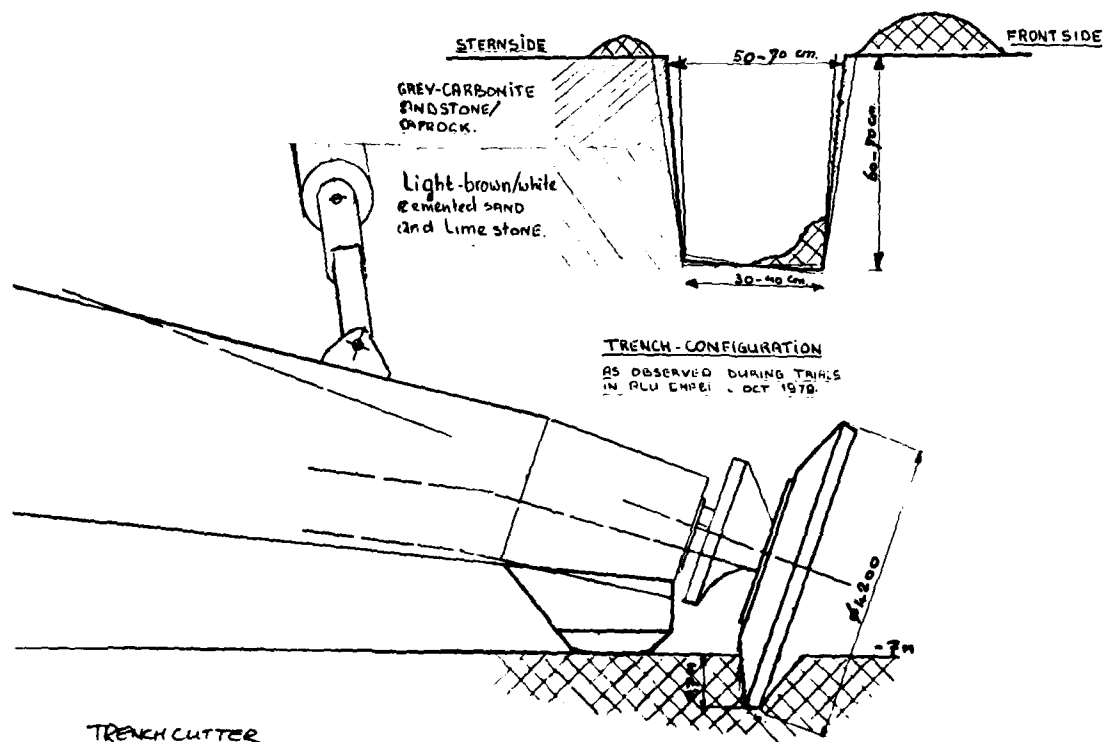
A beveled disc cutter substituted for the cutterhead of a conventional CS dredge (Volker Stevin Dredging).
